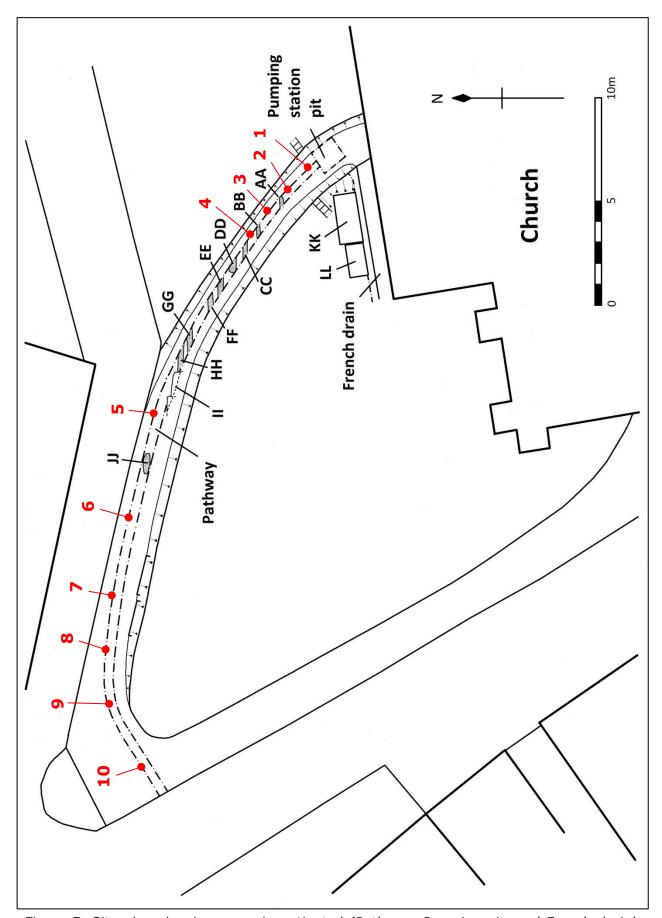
Site plan showing areas investigated (Pathway, Pumping pit, and French drain) and location of graves found within the path (lettered). Recorded sections shown in red.
